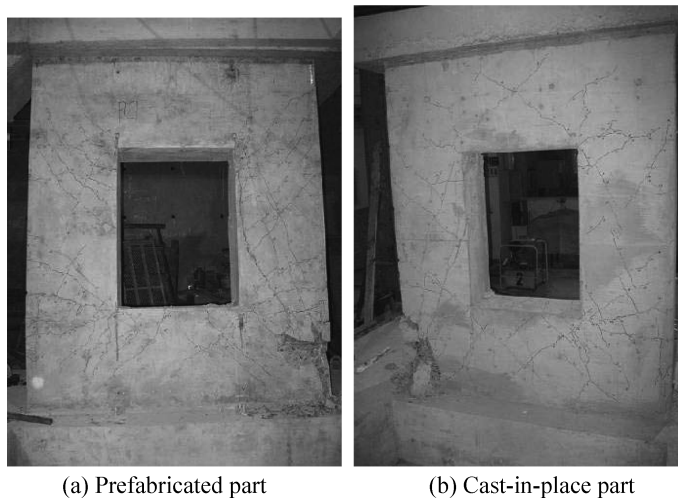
Crack distribution and failure mode of the composite wall with an opening
